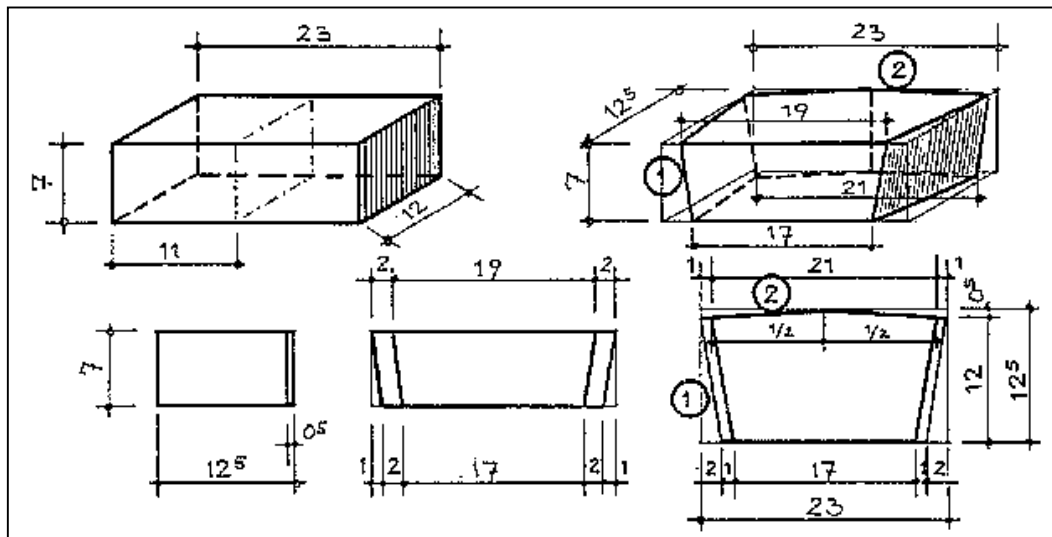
Concrete Blocks for dome construction If bricks are not available, concrete blocks of brick-size may be used instead. As they are difficult to chop, they should be shaped to suit the curve of the sphere. It saves mortar, if the heads (1) and the outer side (2) are angled. The shown dimensions are only a proposal and have not yet been tried out by CAMARTEC.
